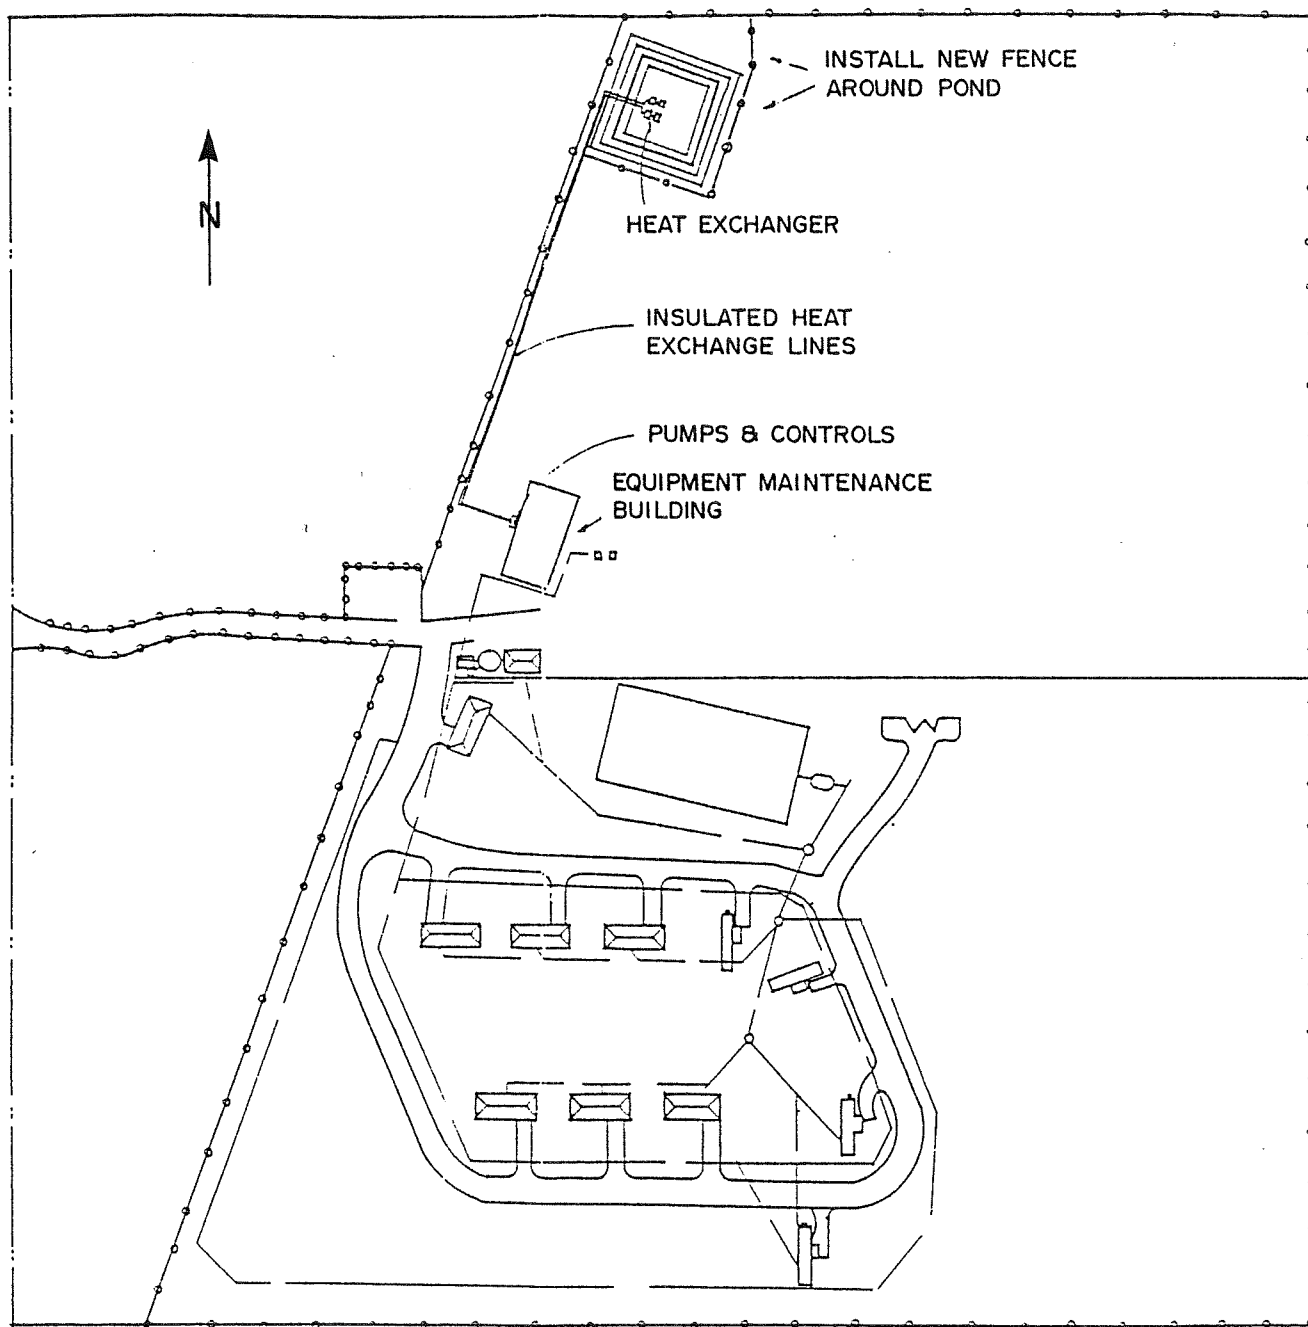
SALT GRADIENT POND - SITE PLAN
